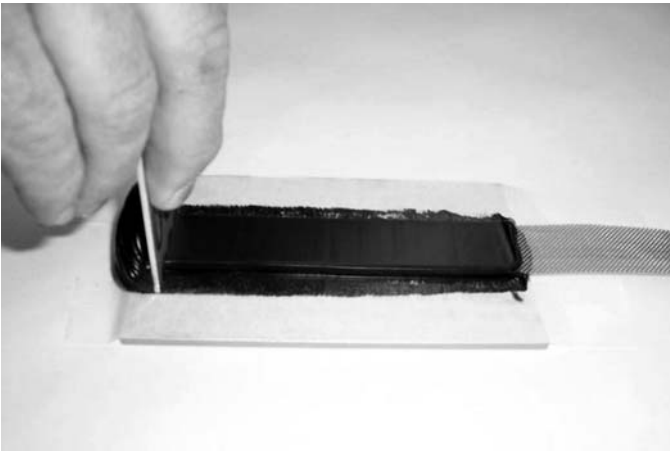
Tooling Second Bead of Sealant with Special Tooling Device – Side B
